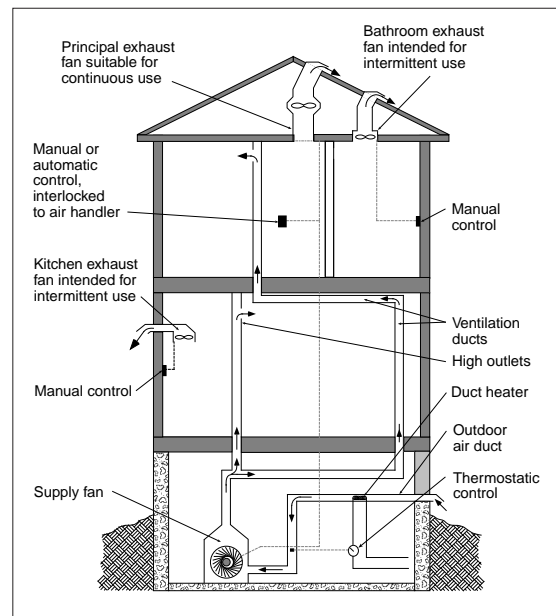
Ventilation system configuration for a house without a forced-air heating system
